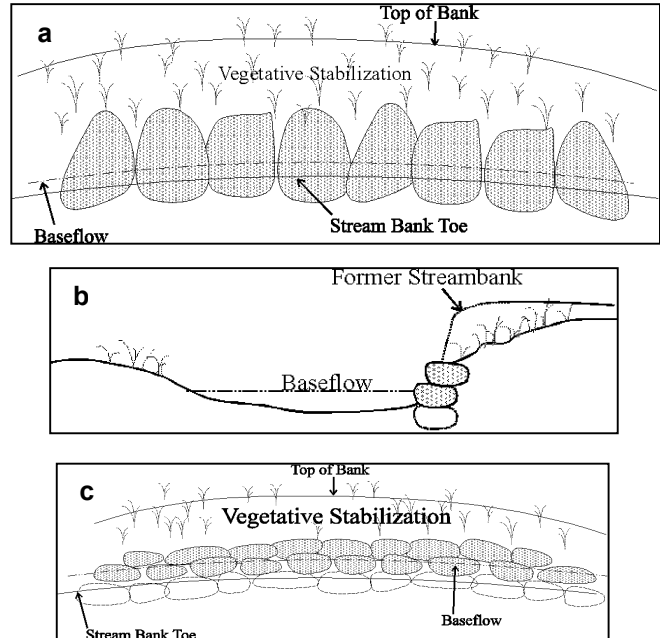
(a) Large boulder revetment, (b) Profile of boulder revetment, (c) Plan view of boulder revetment
